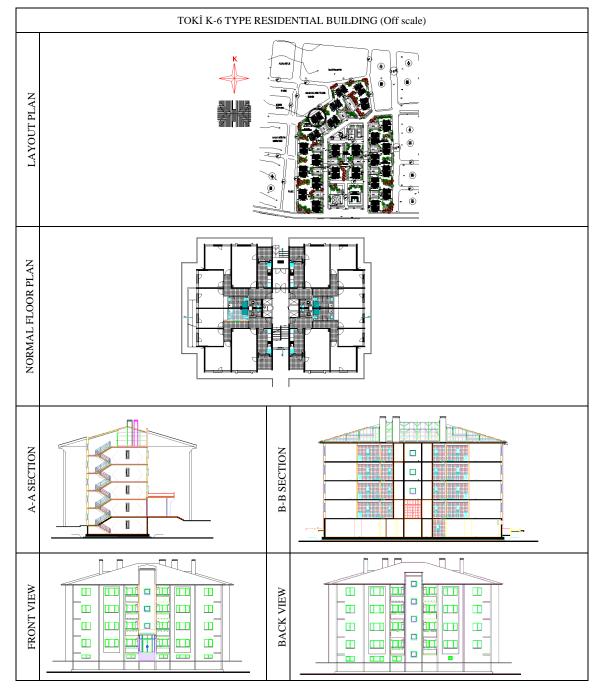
TOKİ K-6 Type Residential Building Project [42]
